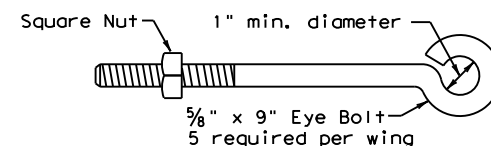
DETAIL OF GATE HINGE BOLT ASSEMBLY
